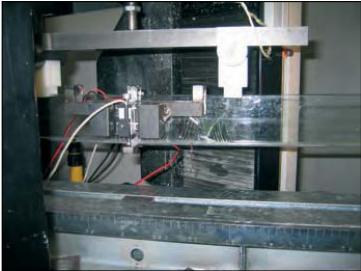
Pictures of the crack development in the reinforced glass beam from Point B to Point D
